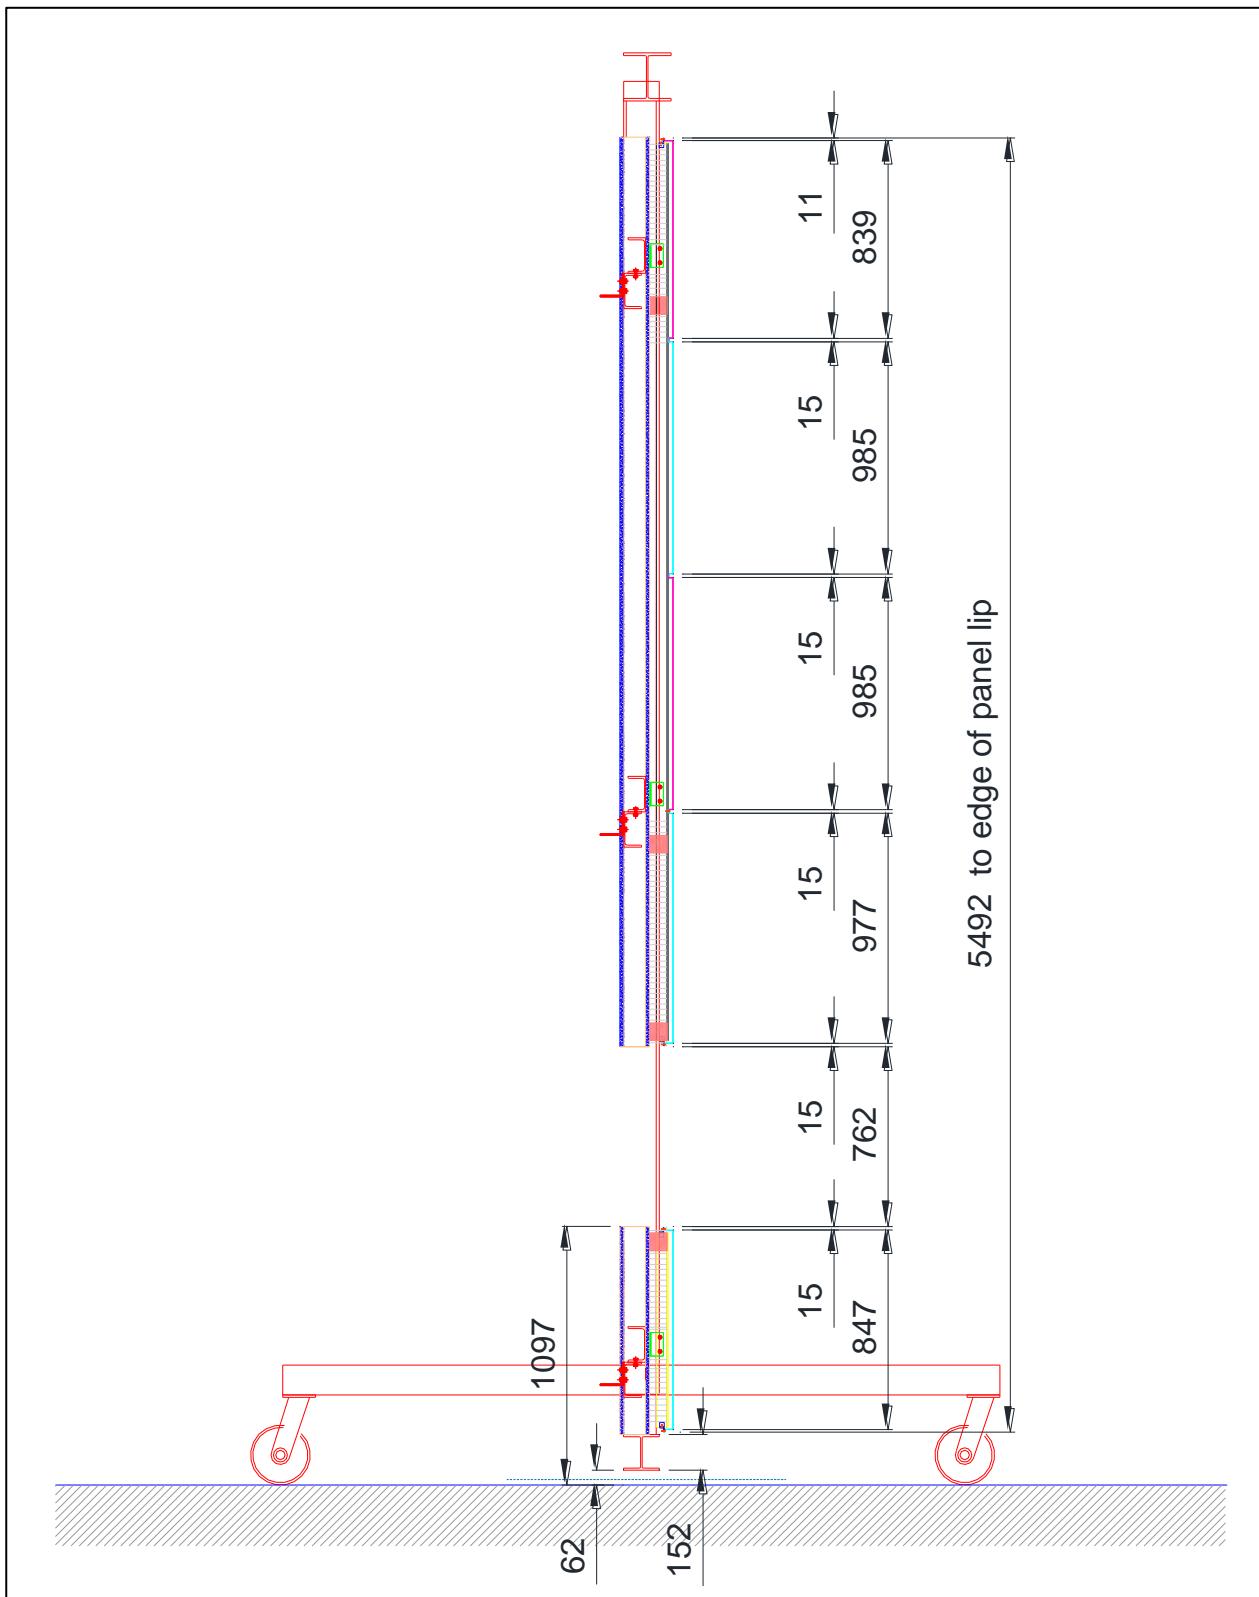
An elevation view of the framing system and position of the fire barrier of the specimen.
